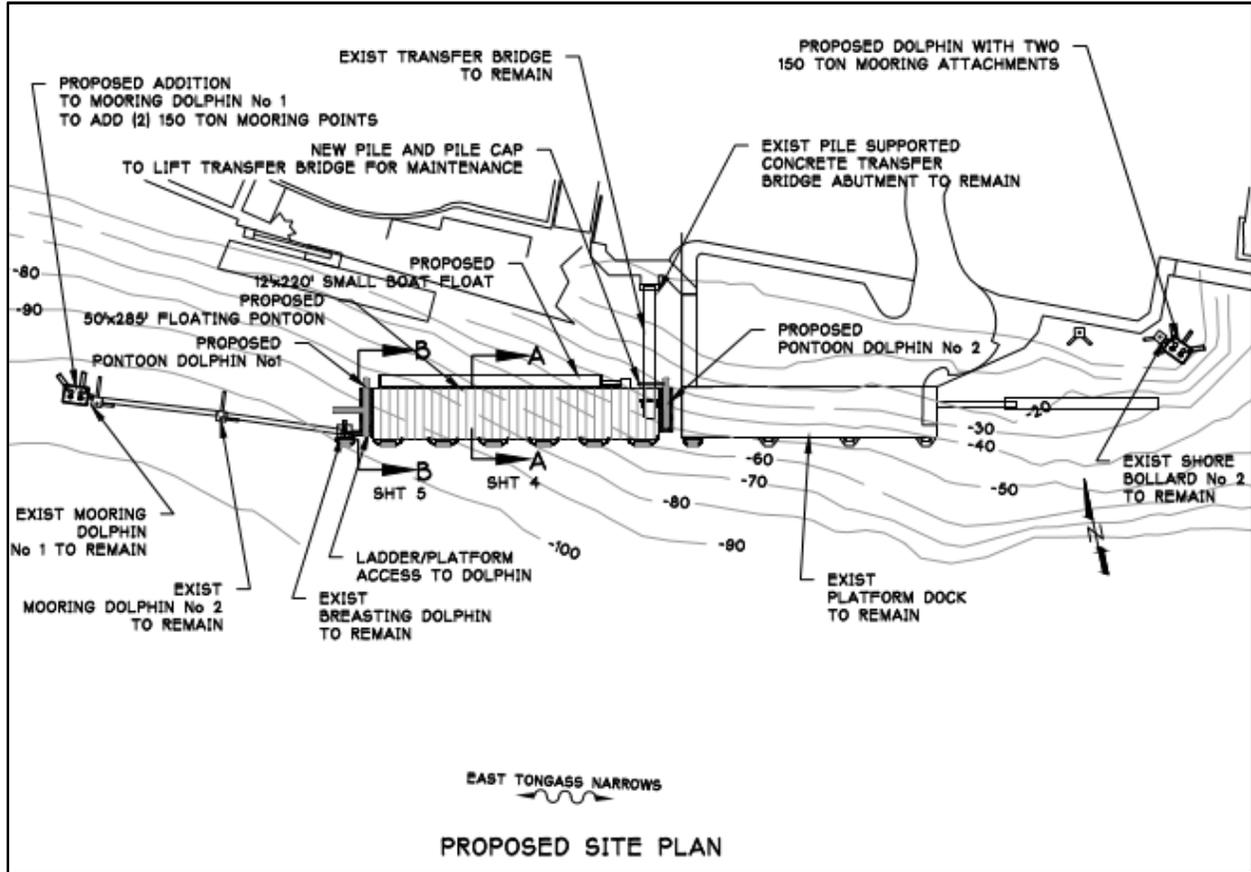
Proposed Site Plan (see Sheet 3 for more detail)
